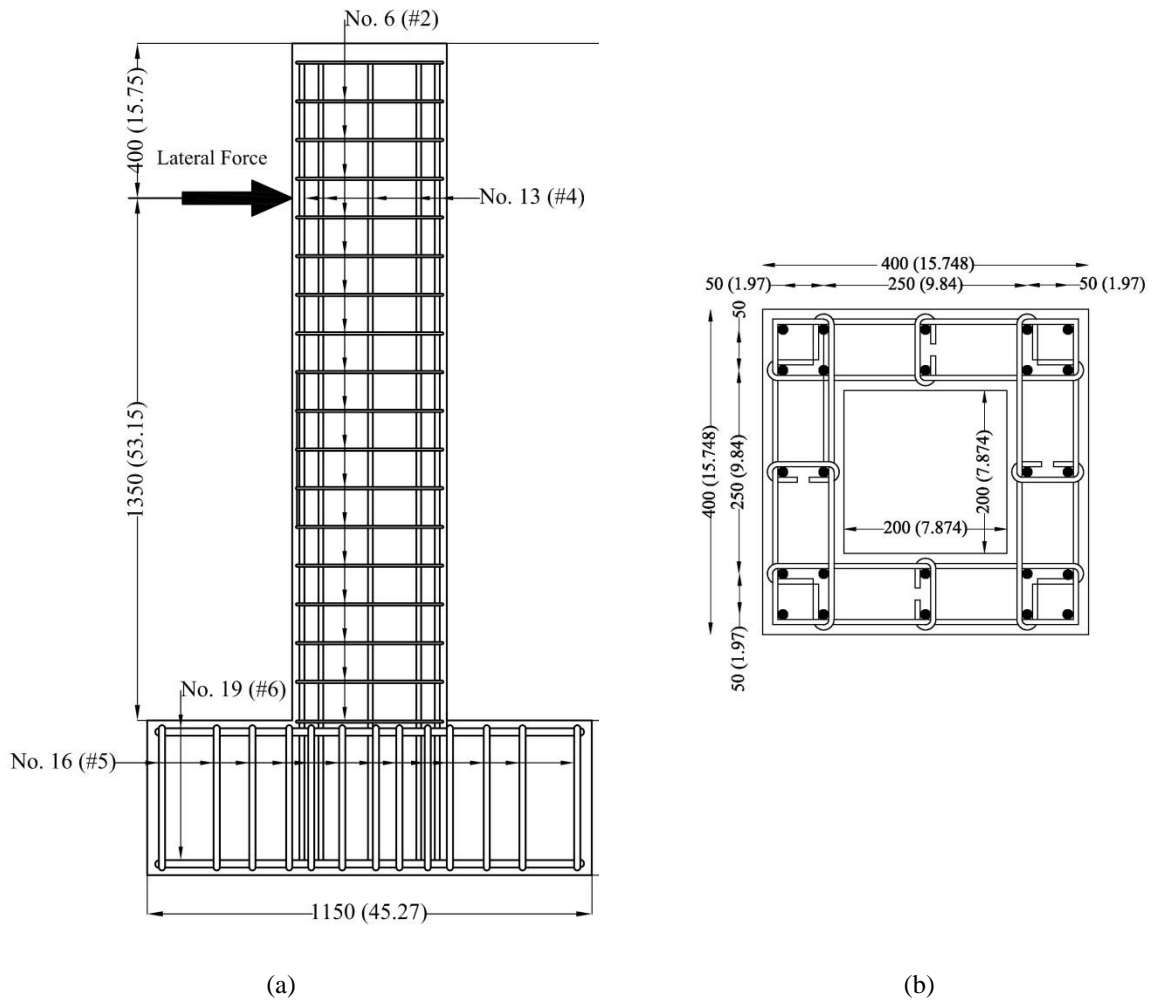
Geometry and reinforcement of the specimen TP-36; (a) elevation, (b) cross section
